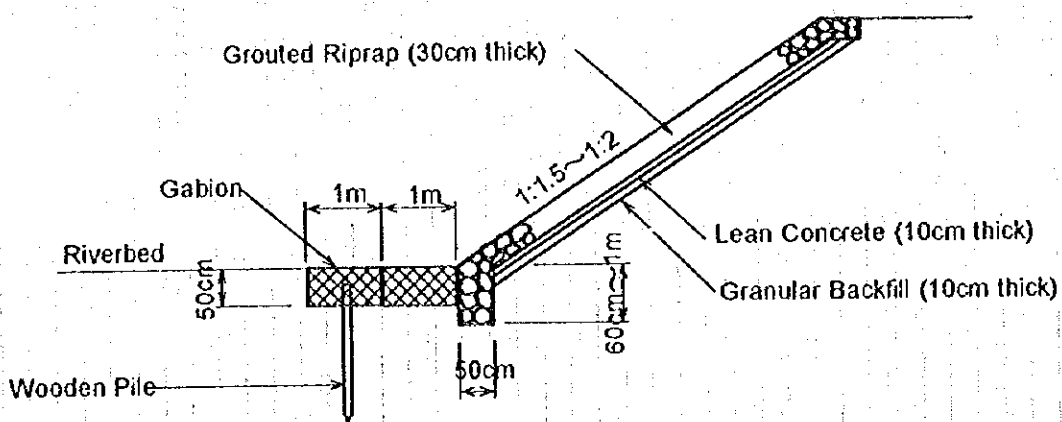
TYPICAL SECTION OF REVETMENT AND SCOURING PROTECTION
